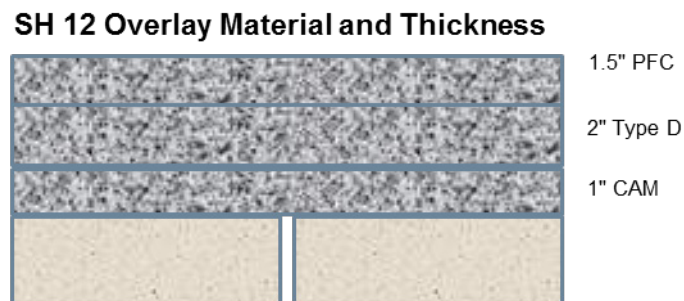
Schematic Diagram of SH 12 Pavement Structure.
